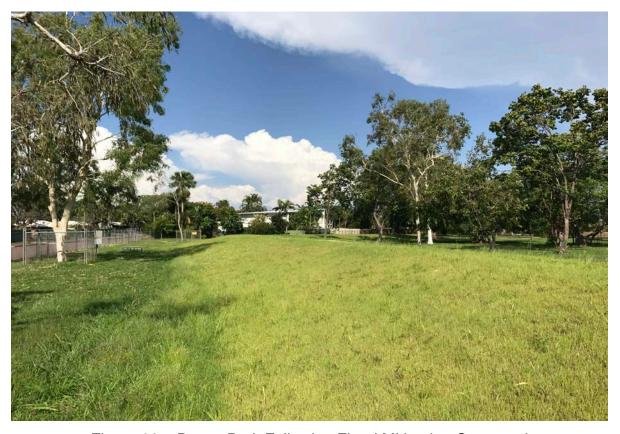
Dwyer Park Following Flood Mitigation Construction
